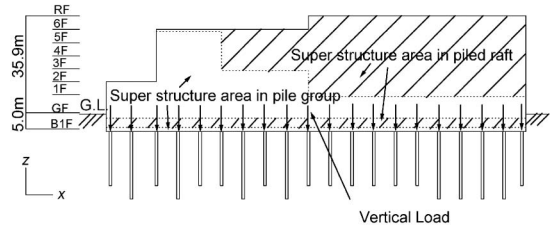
Construction areas of superstructure in stages of pile group and piled raft
